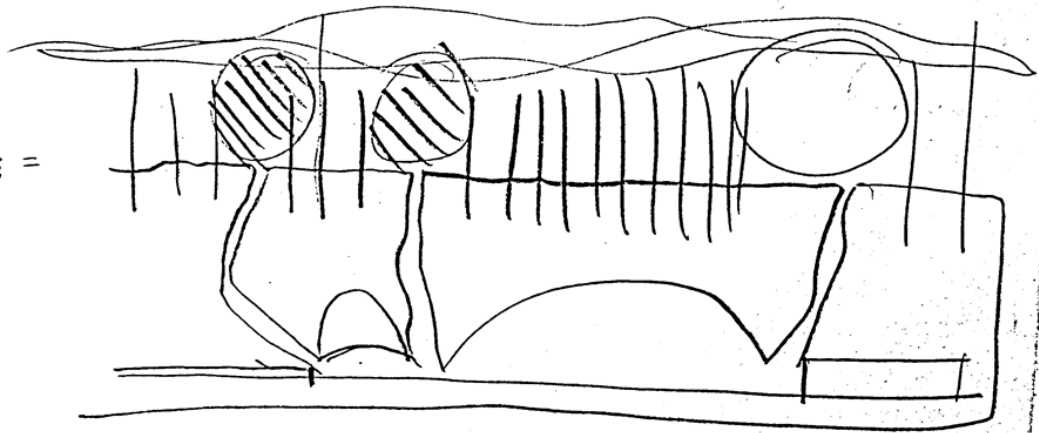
Construction Touchstone concept sketch (Author, 2021).
